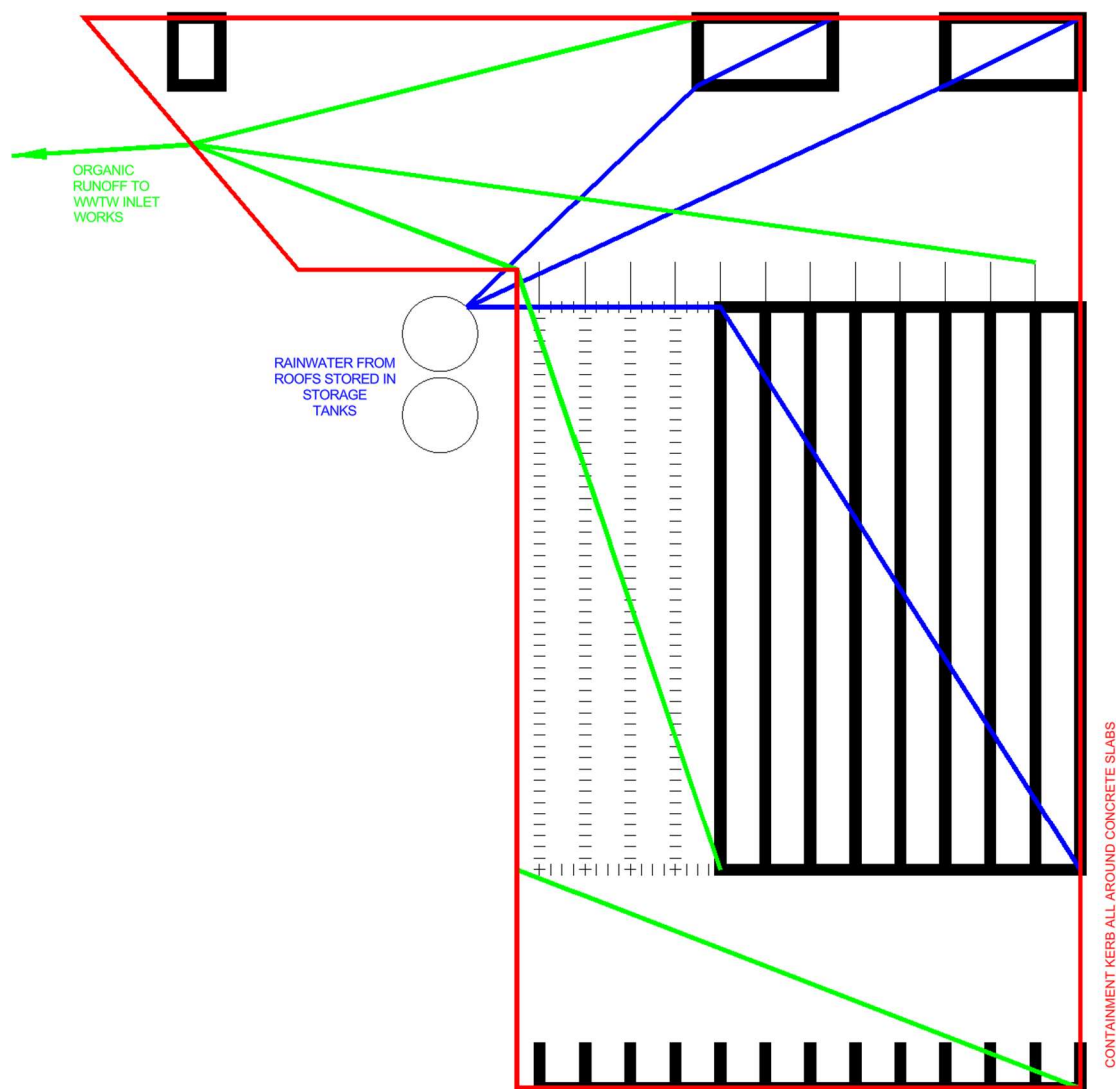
Schematic Stormwater Management Plan for Gwaing BBF
